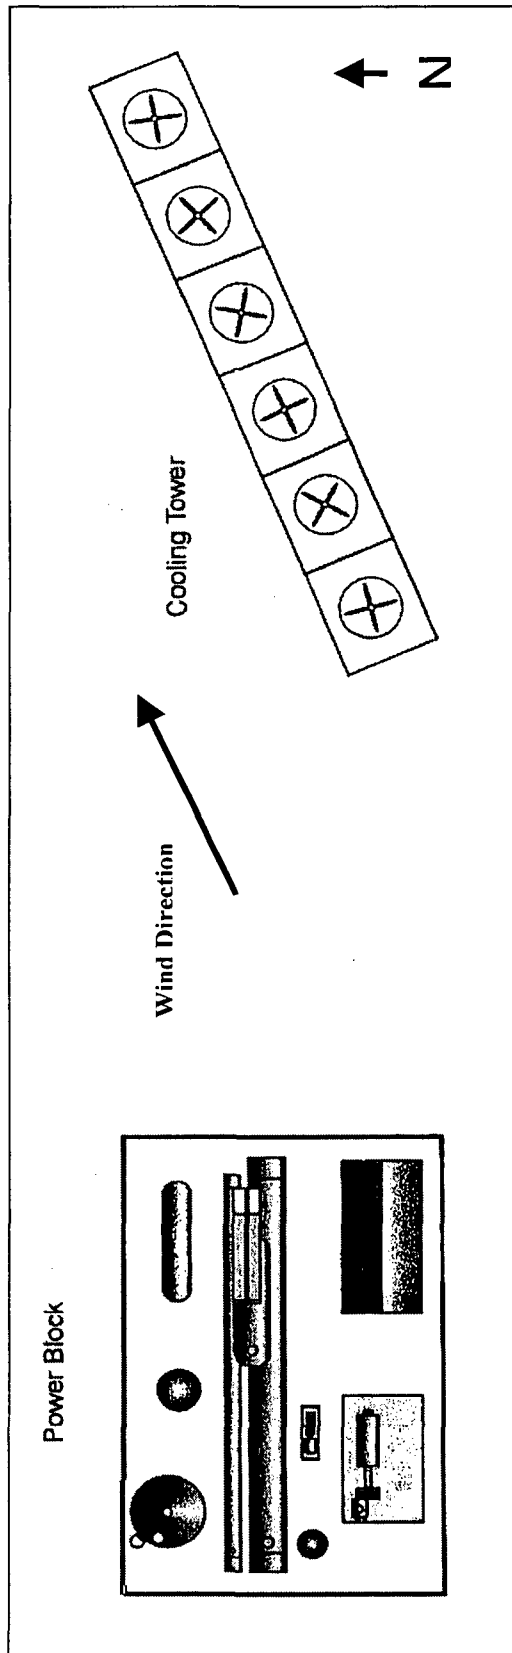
Proposed Power Block and Cooling Tower Layout
